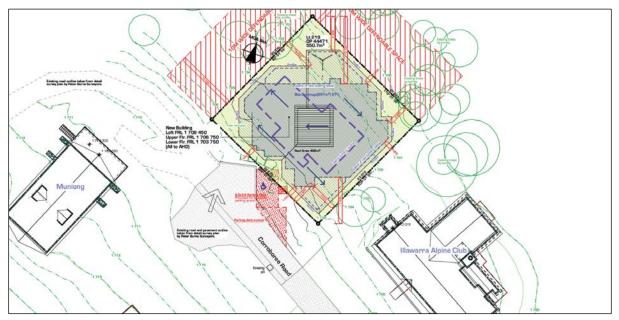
APPROVED DISABLED PARKING DESIGN AND LOCATION
